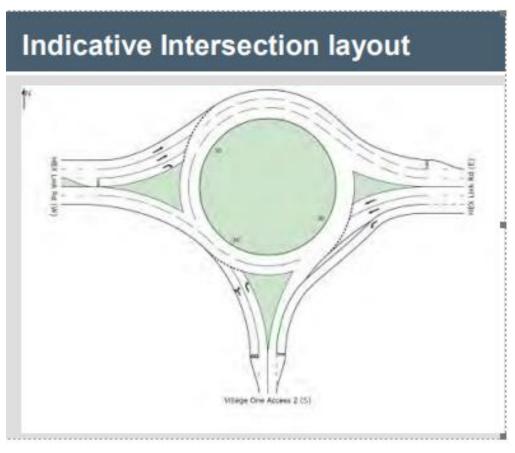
Indicative layout for the roundabout controlled intersection of HEX link road and northern access road
